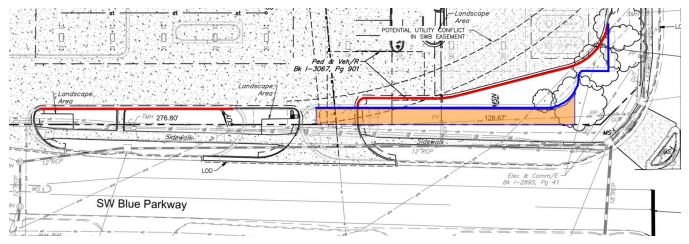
Existing curb line shown in red. Proposed curb line shown in blue. Proposed parking setback reduction area shaded orange.
